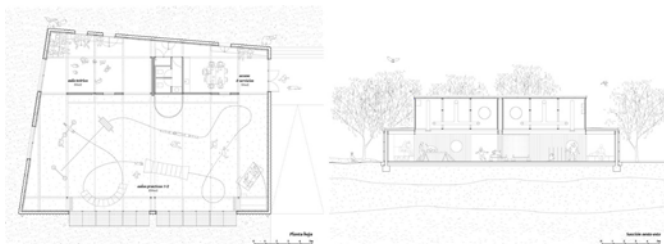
The Educan School Dogs, Humans and Other Species, building ground floor plan and section (Image courtesy of Eeestudio + Lys Villalba).
